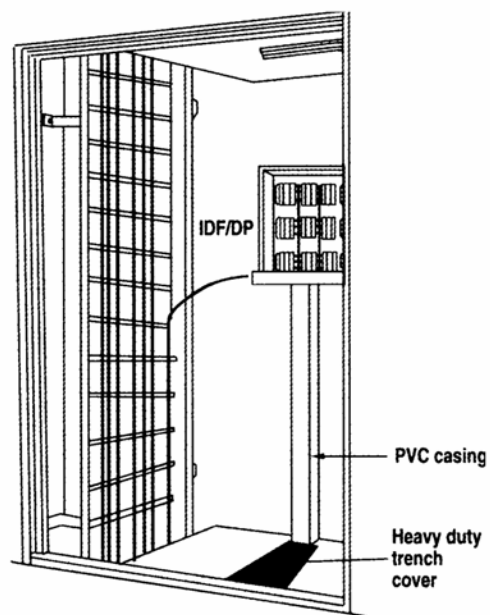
FLOOR TRENCH IN CENTRE OR RISER
